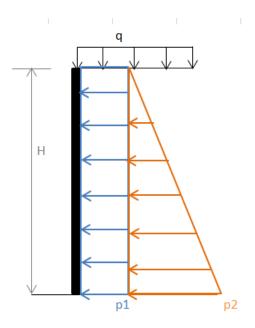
Lateral Earth Pressures for Retaining Wall Design
